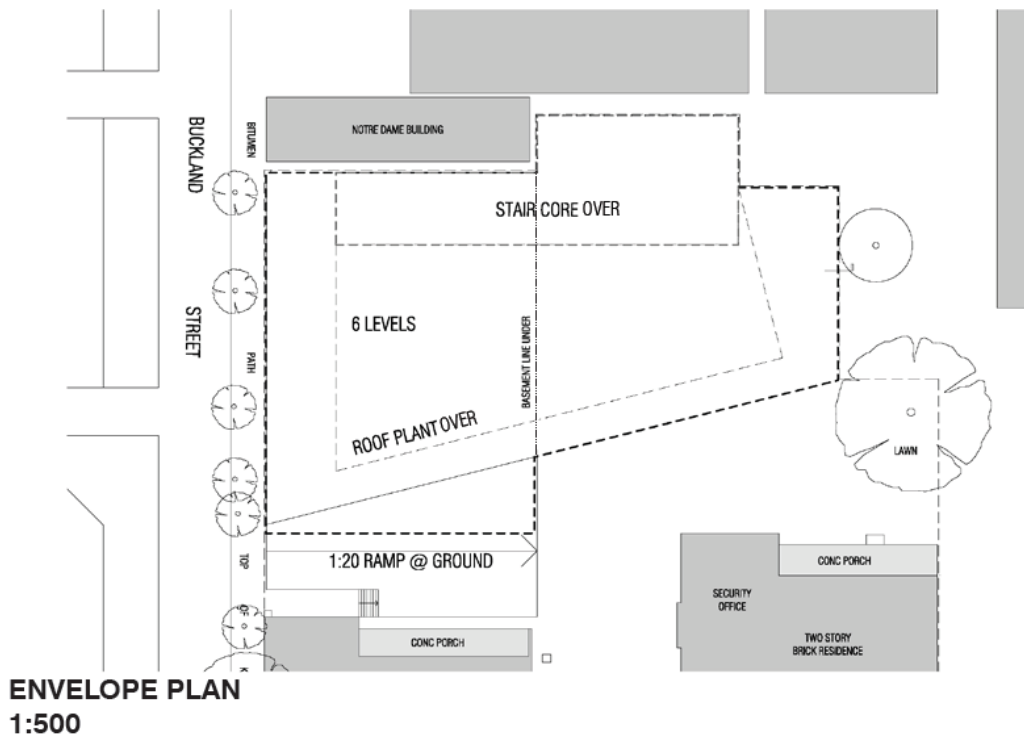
Proposed design envelope plan for the UTS Blackfriars Research Building. H2O Architects, 13/8/2015.
